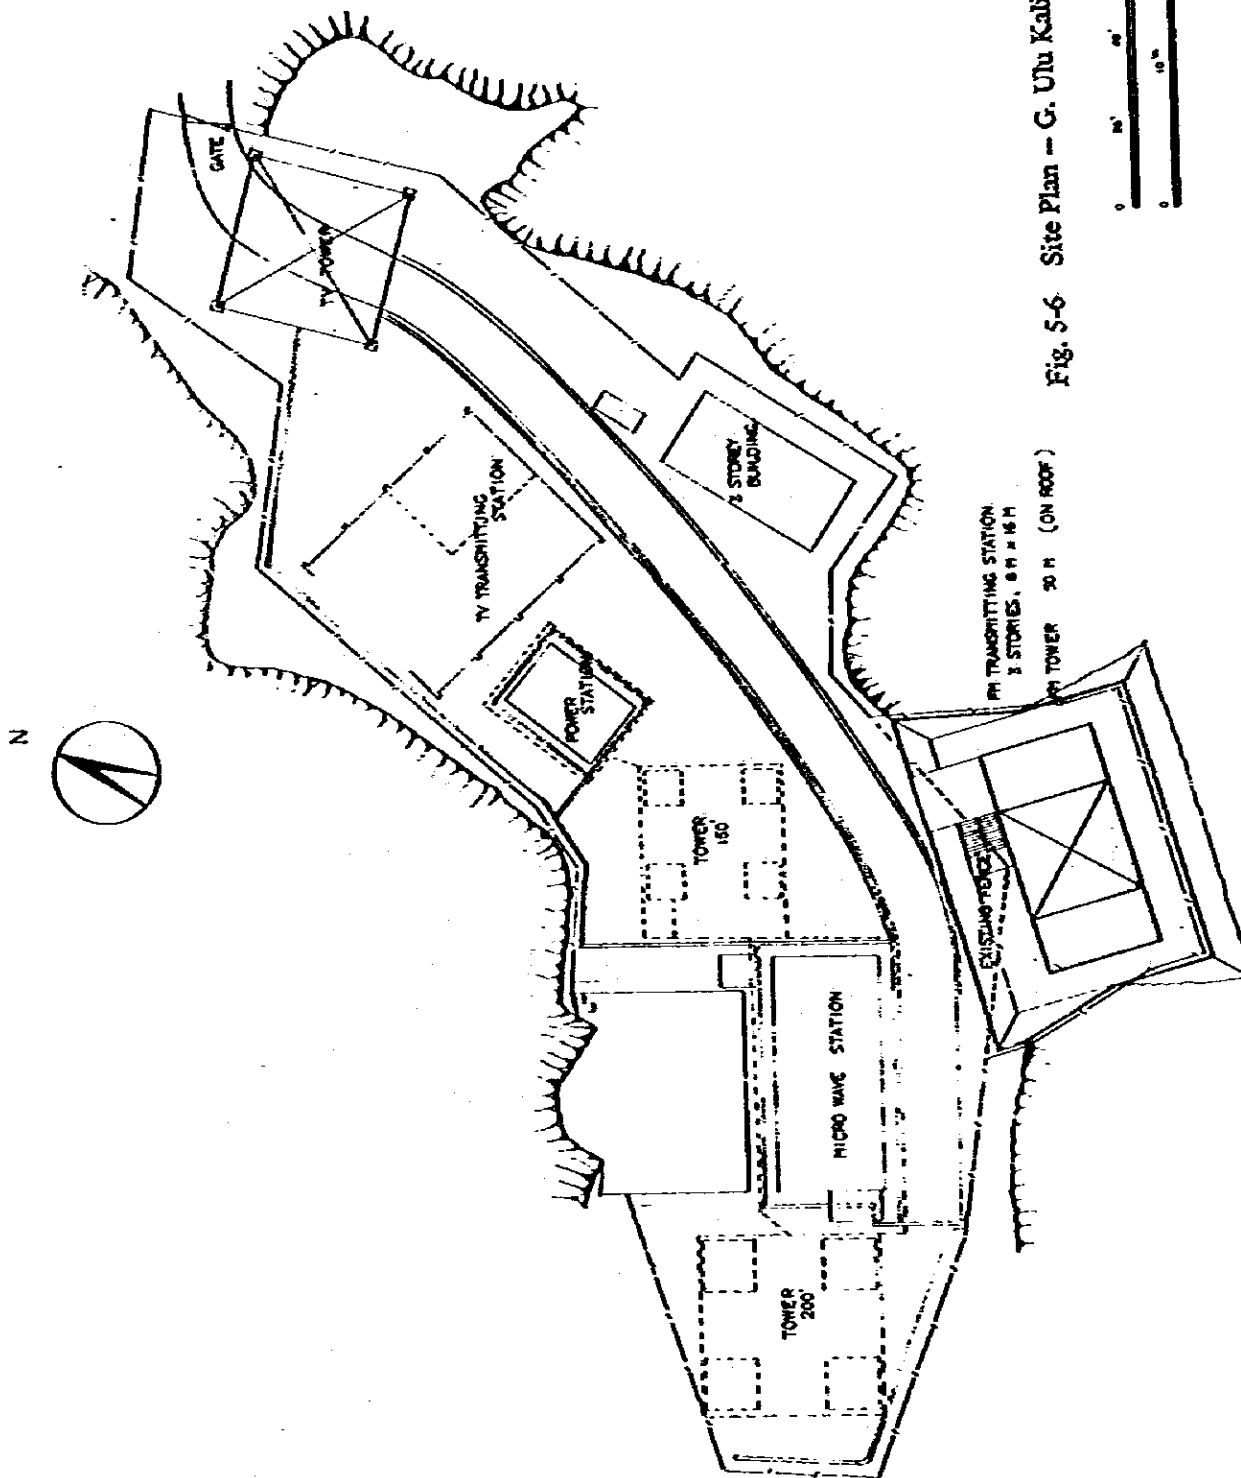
Site Plan - G. Utu Kali, Selangor
